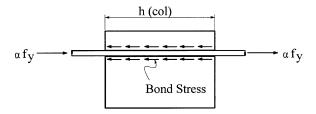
Idealized bond stress on straight bar passing through the joint.
